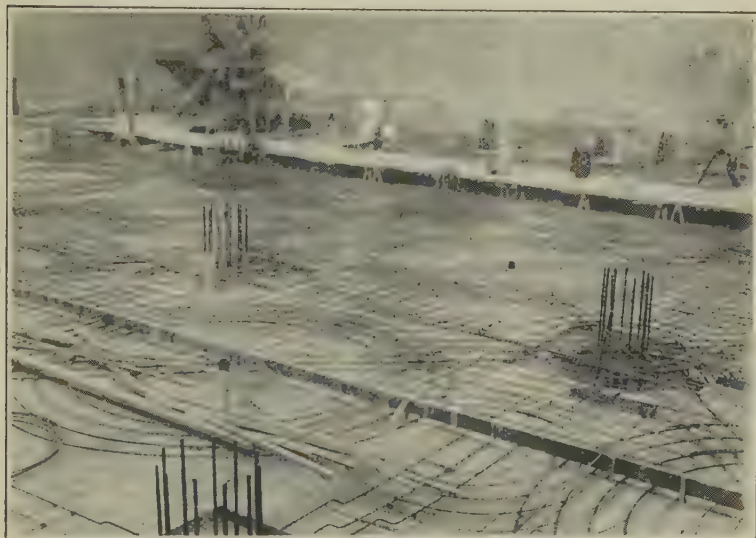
VIEW OF REINFORCEMENT IN TEST AREA.
